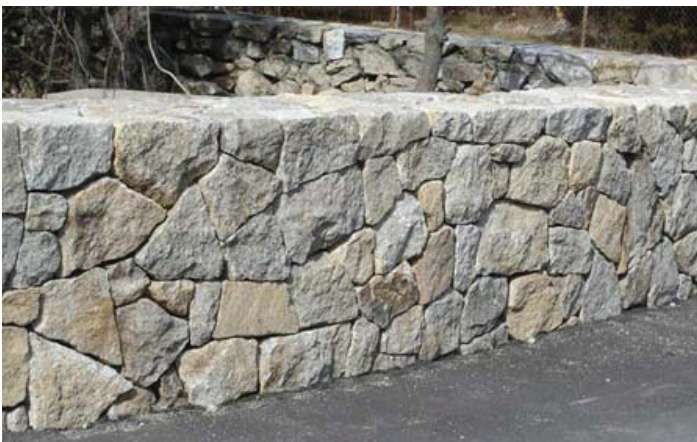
An example of a wet-laid (mortared) stone retaining wall.
